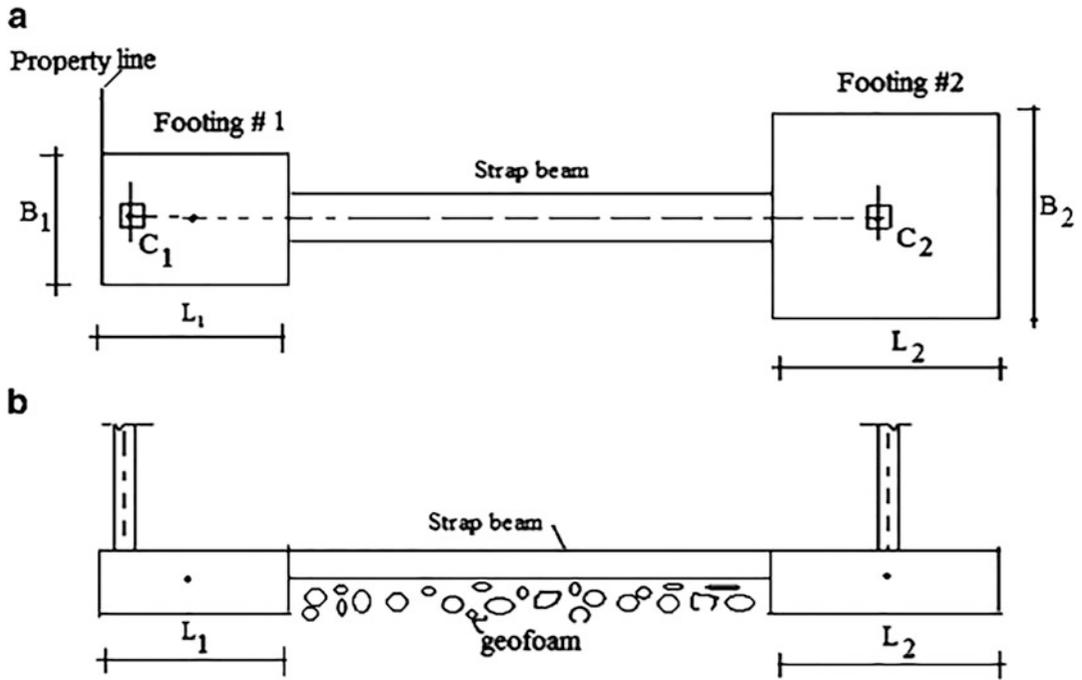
Strap footing. (a) Plan. (b) Elevation
